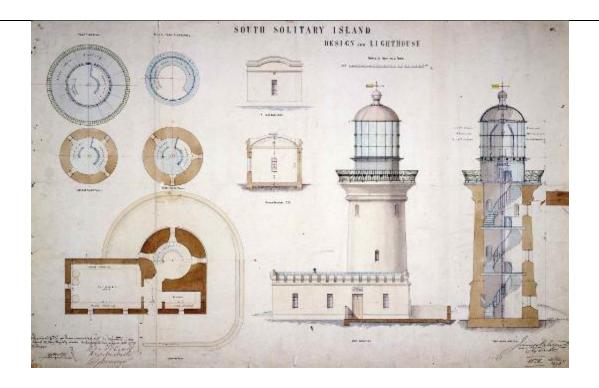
Architectural plans, 1879: Scale drawing of South Solitary Island Lighthouse, including cross sections and floor plans.
